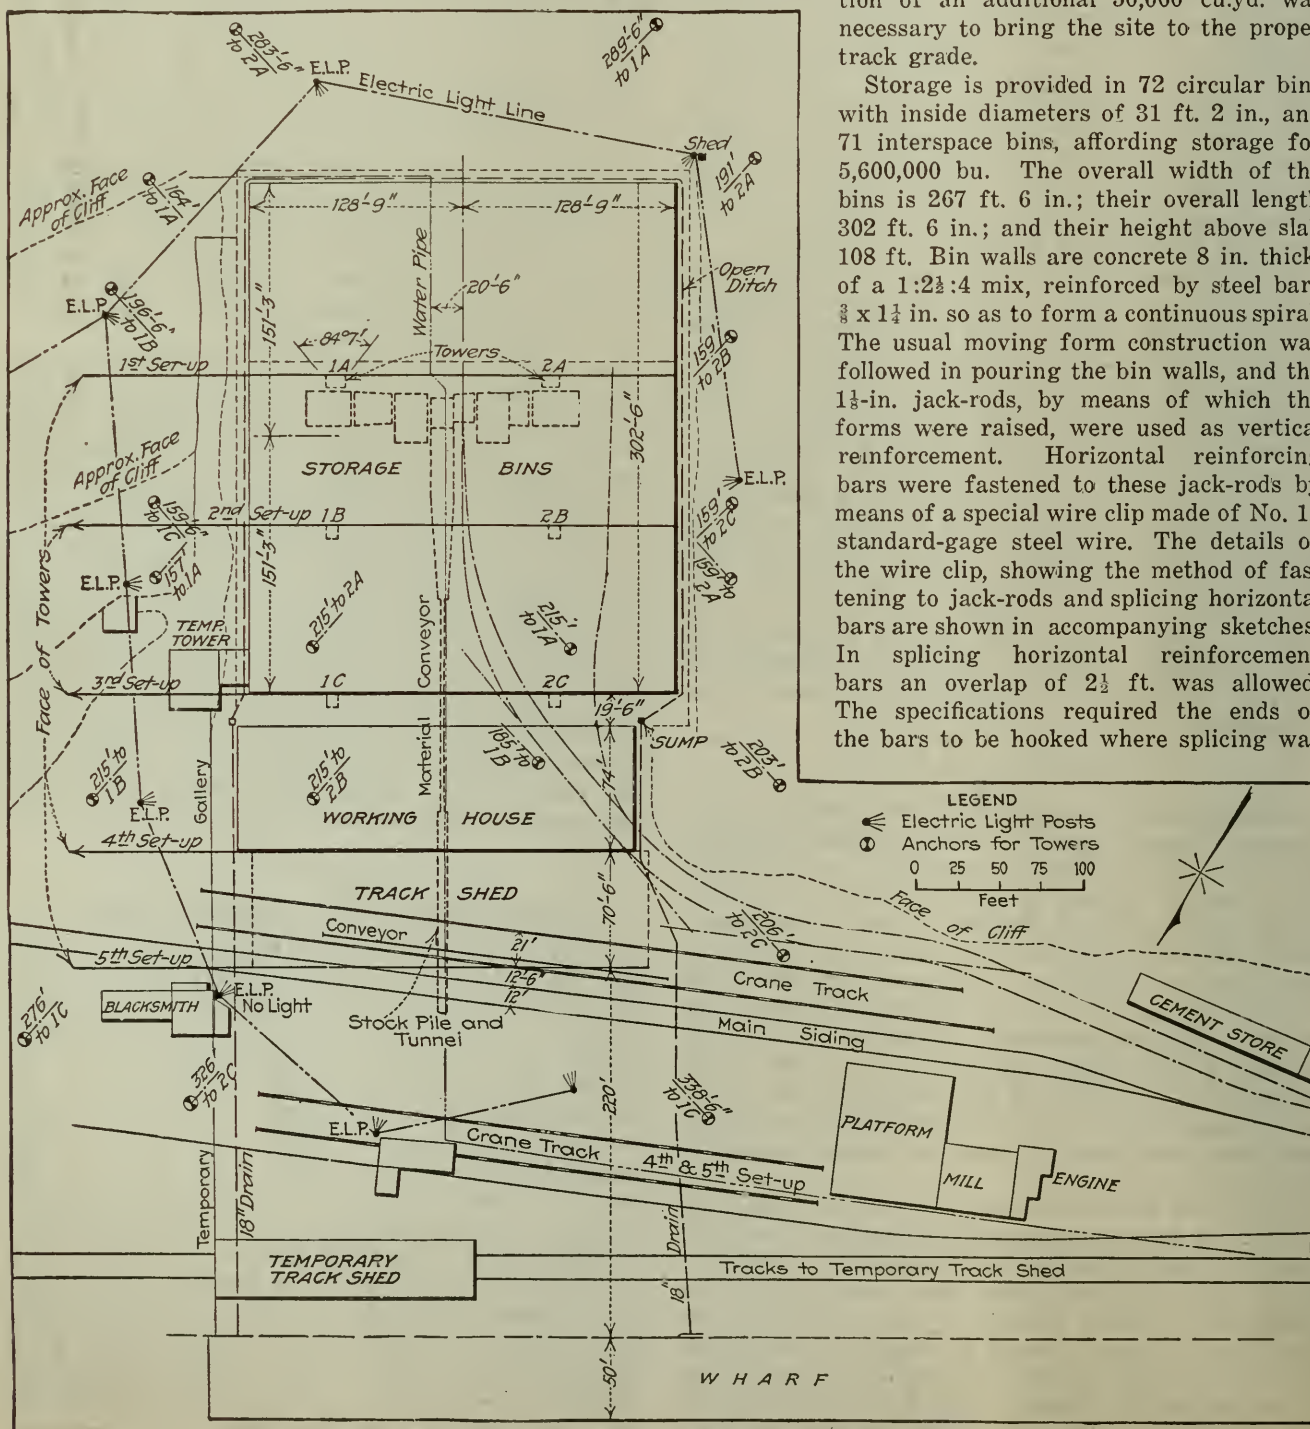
CONTRACTOR'S LAYOUT INDICATING TOWER ANCHORAGE POINTS AND TOWER SET-UPS
